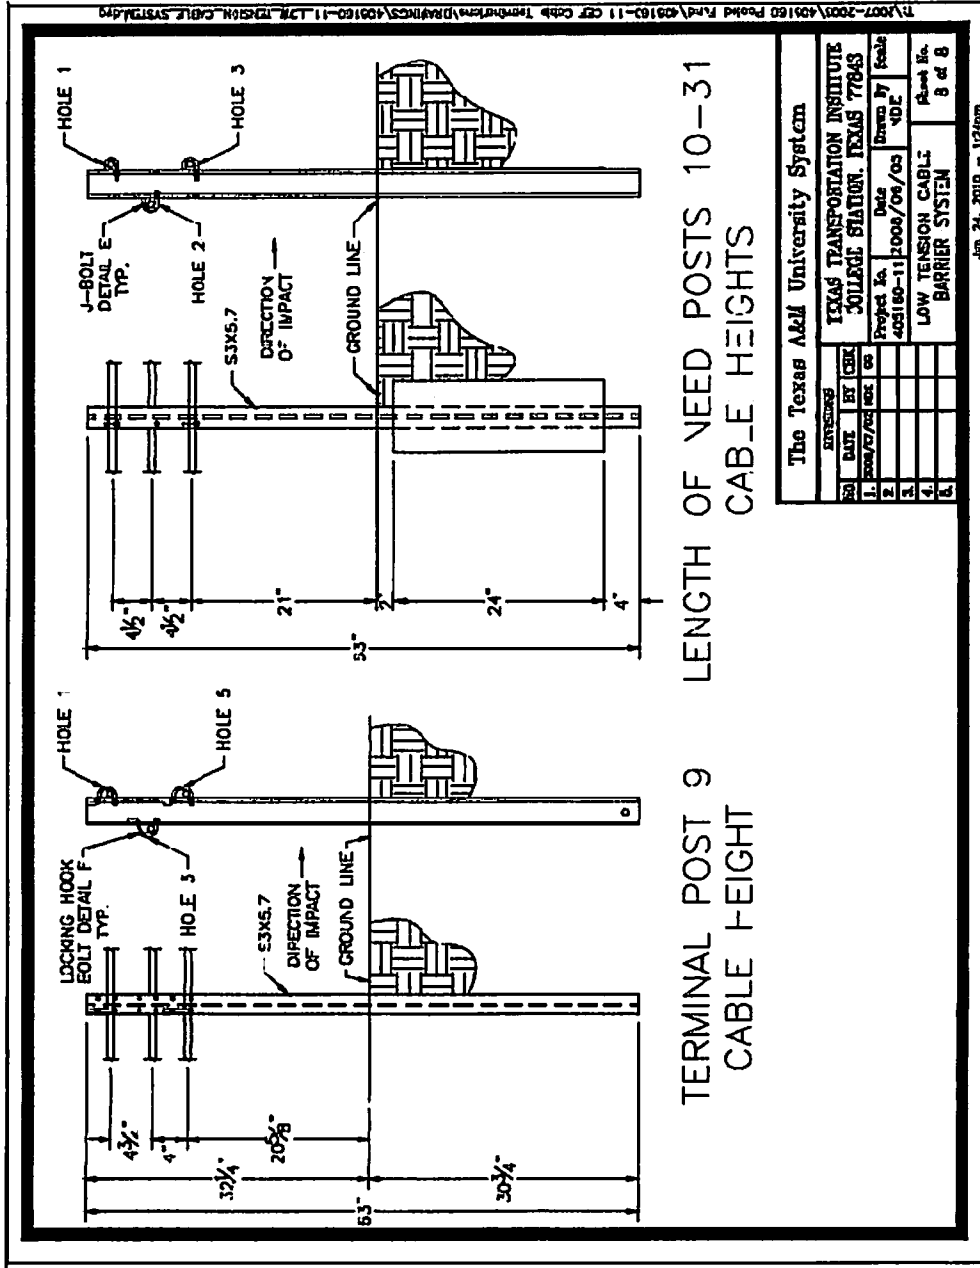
Details of retrofitted low-tension wire rope barrier system -- LON post wire rope heights.
